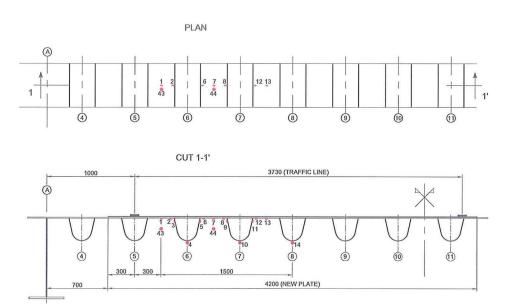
Transverse location of the strain gauges for the short term monitoring - Cross section half way between crossbeam 2 and 3 (dimensions in mm).
